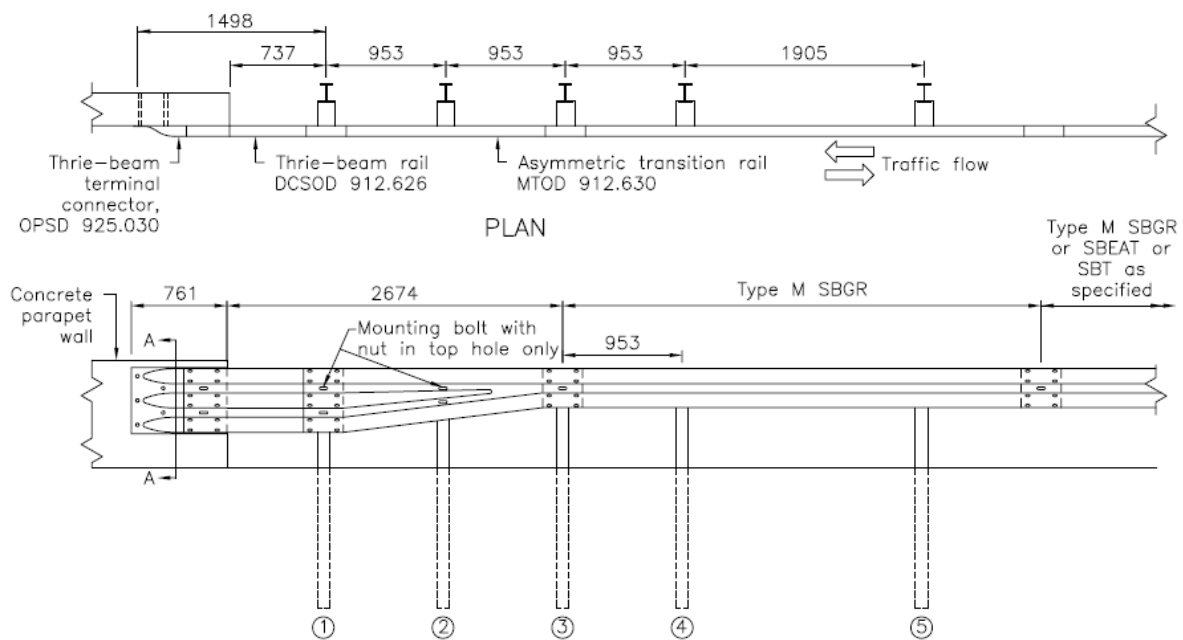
MASH TL-2 SBGR Connection to Rigid Barrier on Low Speed Roads
